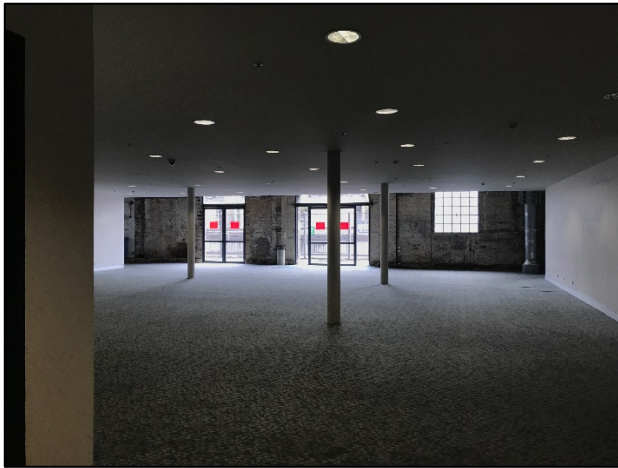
GROUND FLOOR OFFICE SPACE, BAY 4 NORTH, LOW CEILING OBSCURING VIEWS TO HERITAGE WINDOW AND WALL, NON-COMPLEMENTARY WITH HERITAGE FABRIC AND AESTHETIC
